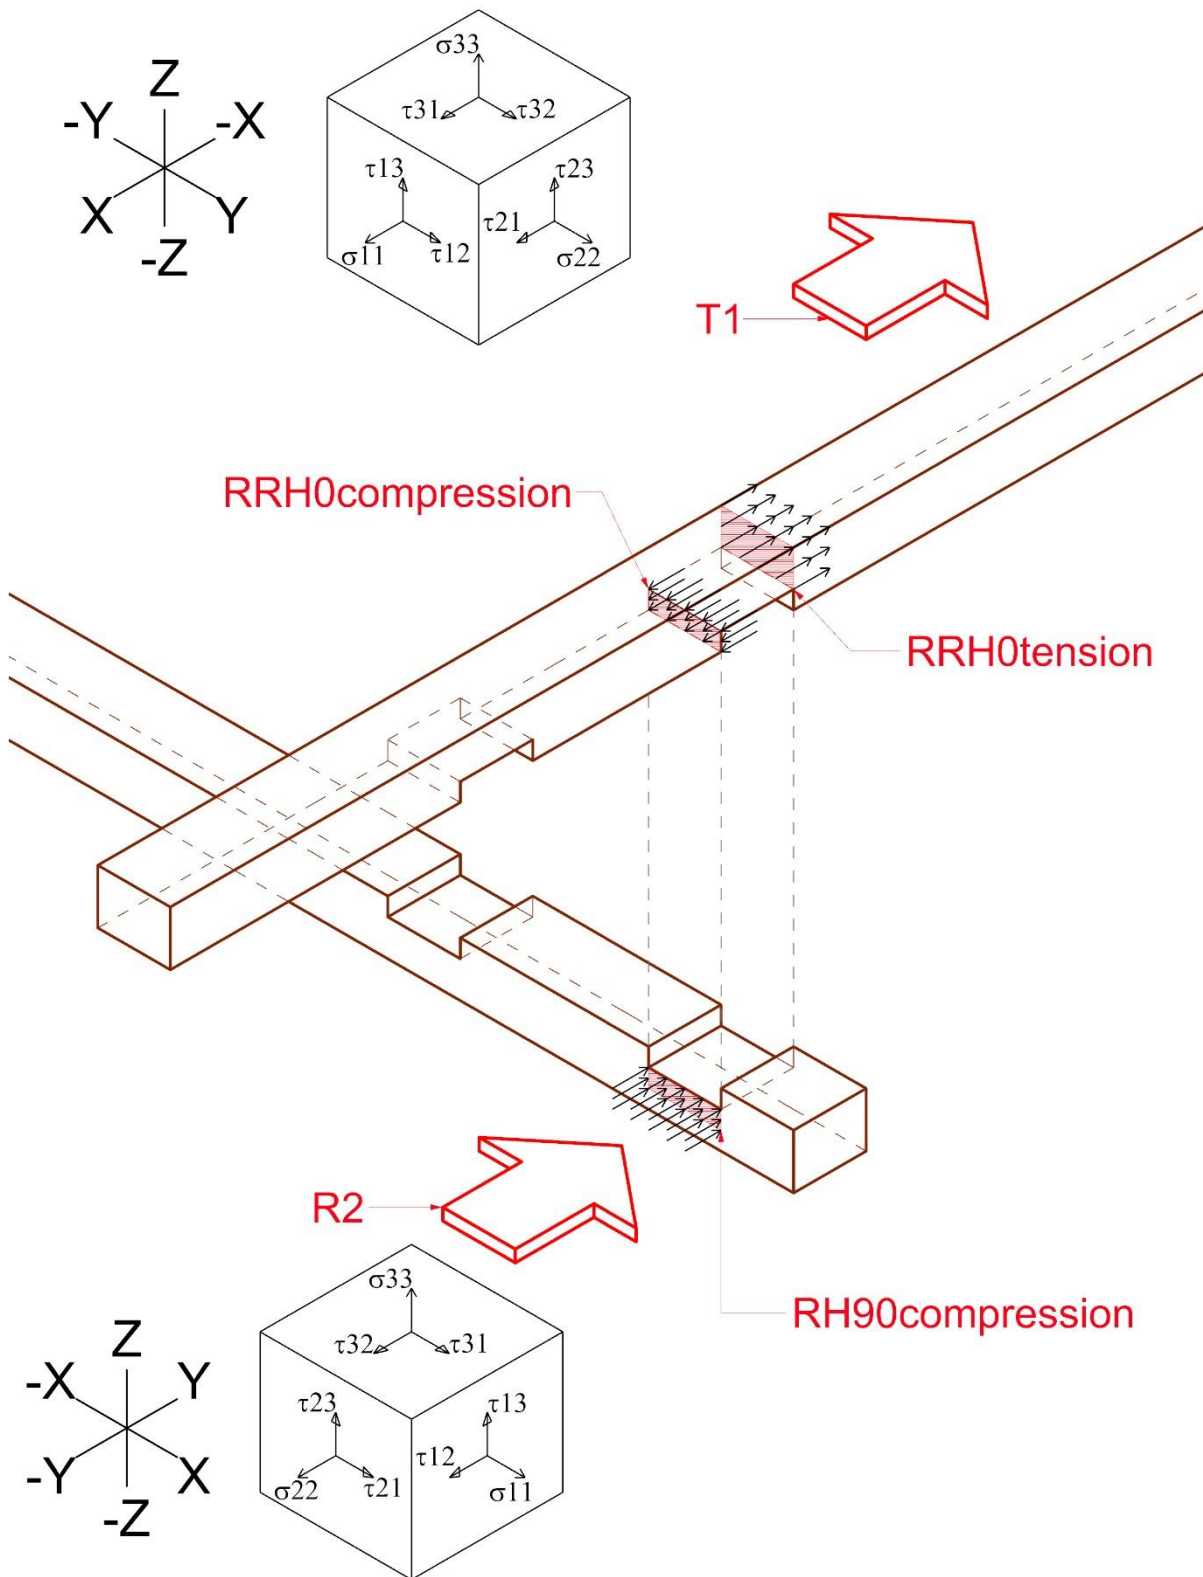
Roof Rafter Head Axial stresses : Crossing rafters T1-R2
